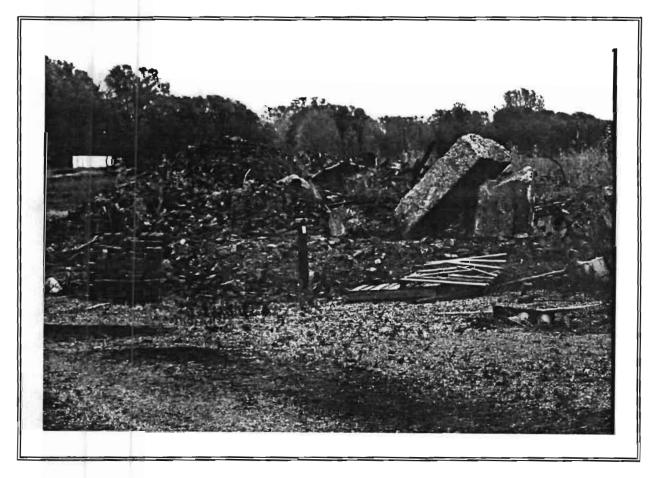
Demolition debris located on former Roblin Steel site just east of the subject property's eastern boundary (note groundwater monitoring well in foreground).
